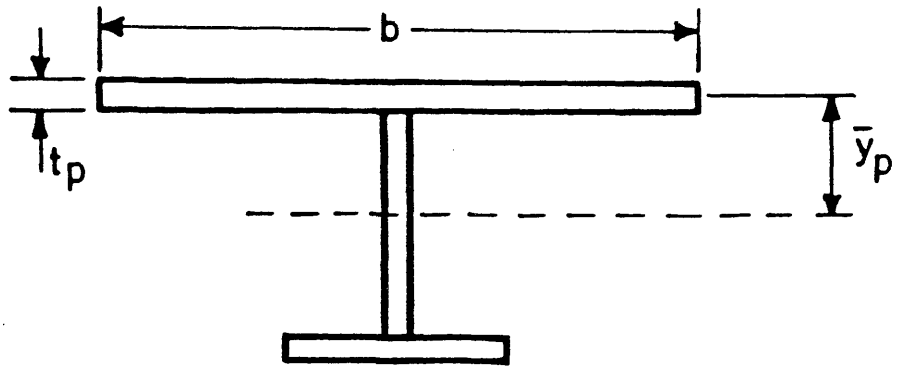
BEAM-COLUMN FORMED BY PLATE AND STIFFENER
